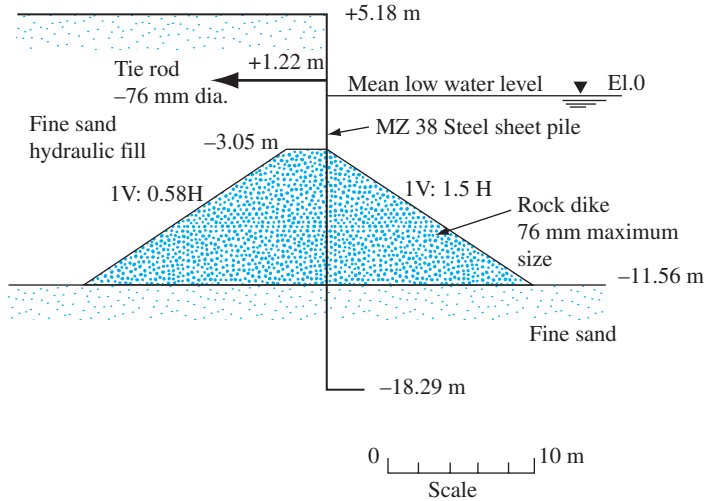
Pier C bulkhead—Long Beach harbor (Adapted after Casagrande, 1973)
